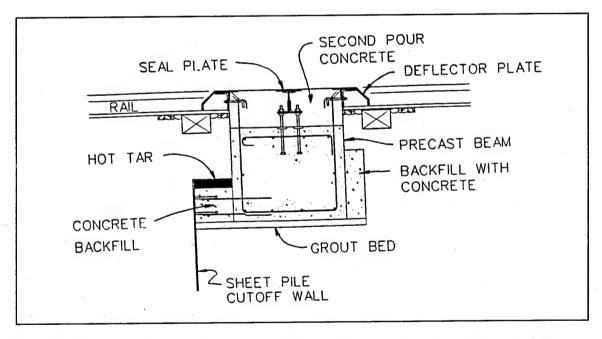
Seal and deflector plate details, Pineville Levee and Floodwall (from Gunnels 1991)
